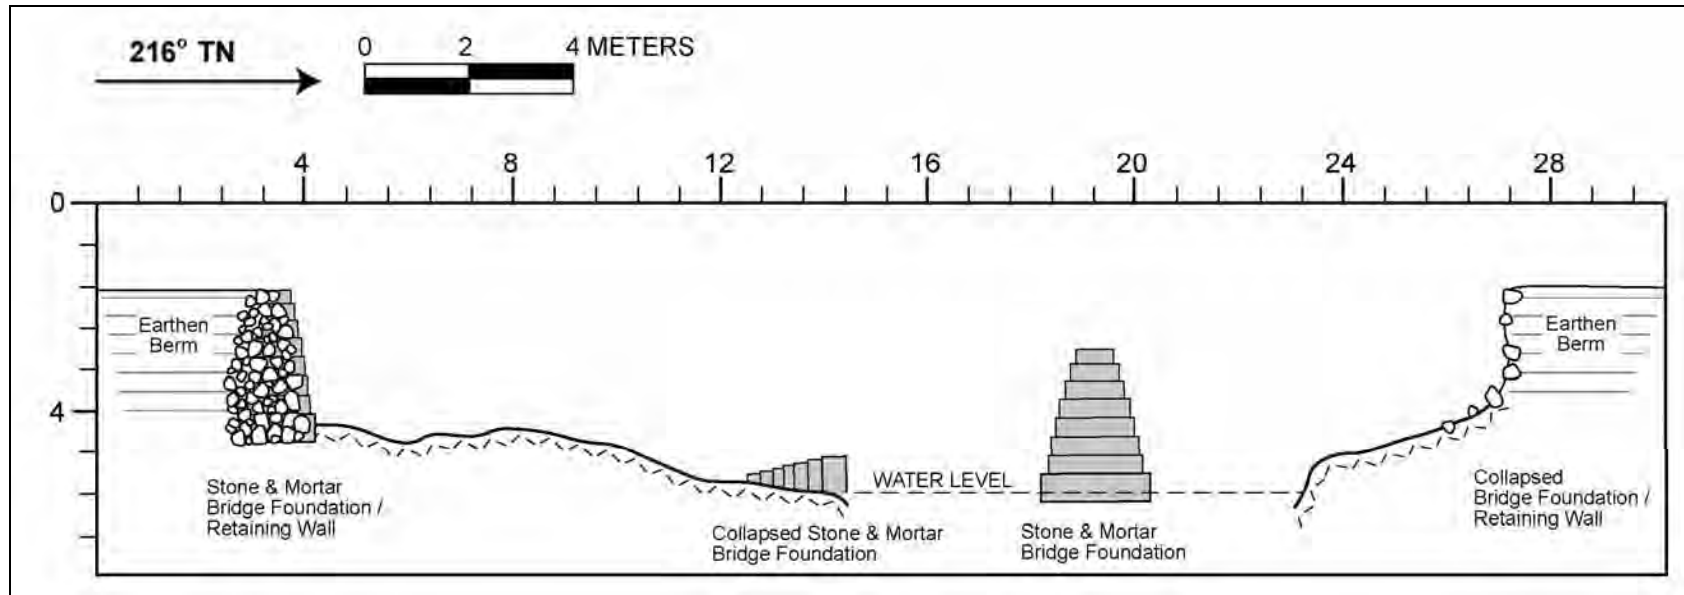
Cross-section diagram of SIHP # 50-80-09-9534 F railroad bridge
